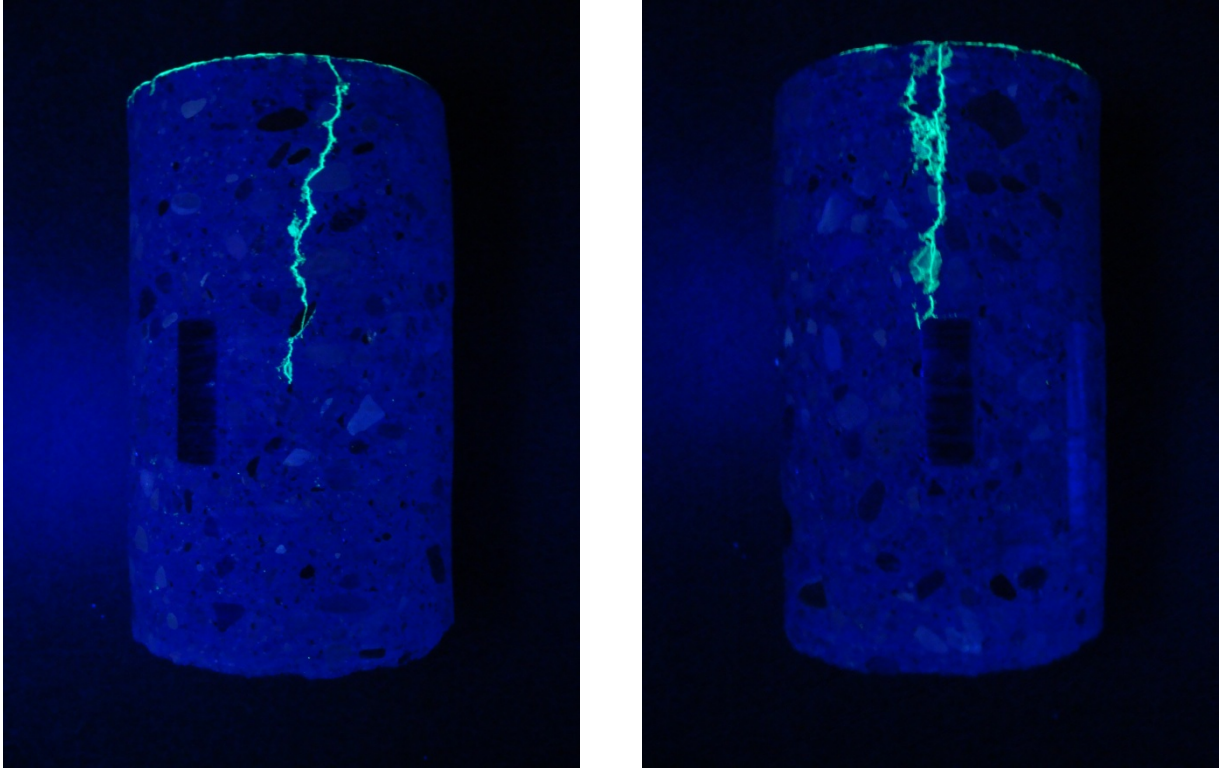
Core TS5 (left) east-northeast elevation; (right) southwest elevation
